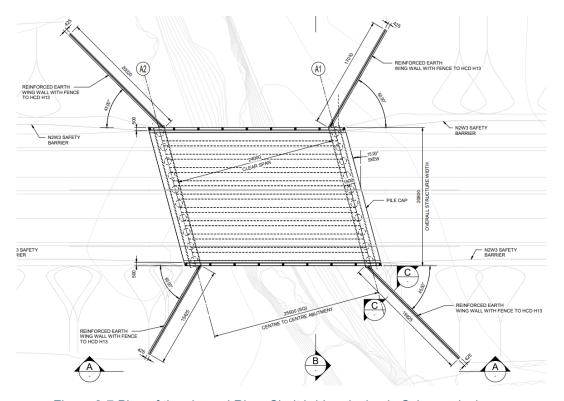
Plan of the skewed River Chelt bridge design in Scheme design
